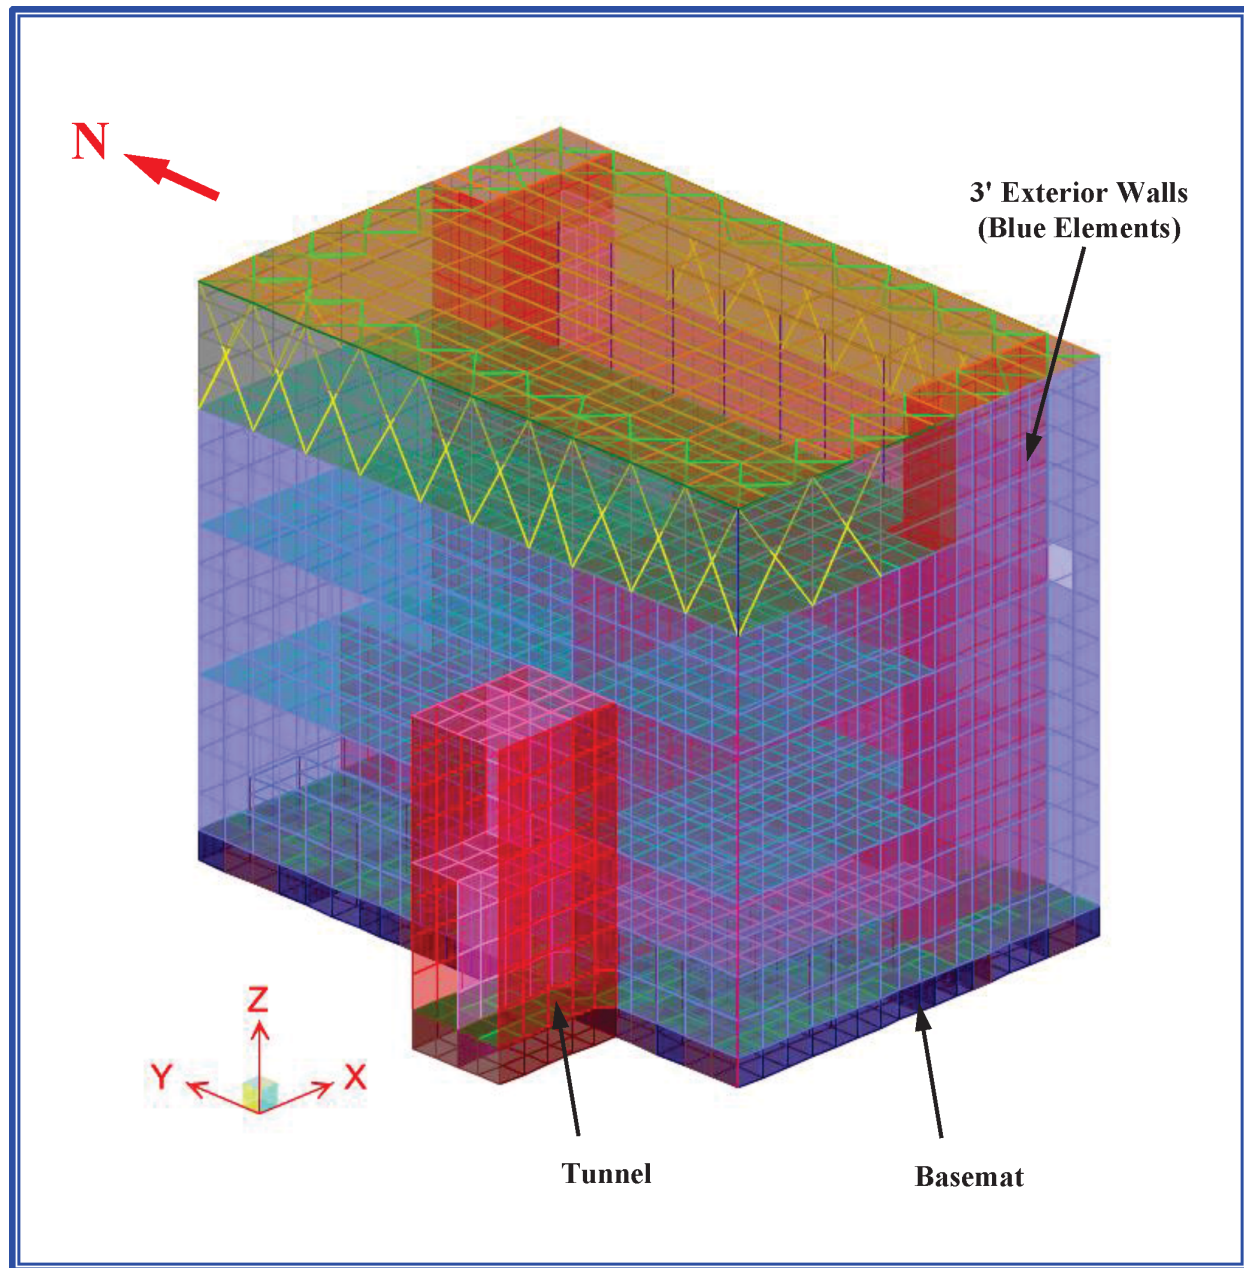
SAP2000 Control Building Model Beam Elements
